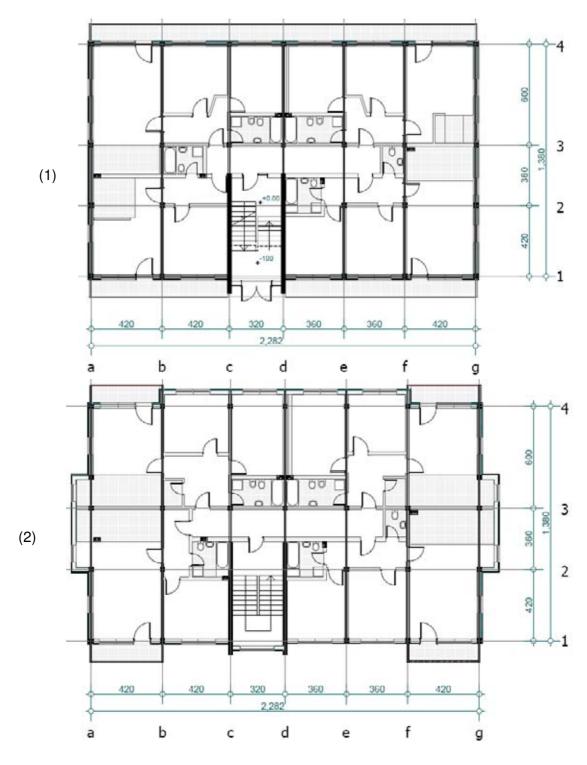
Ground floor (1) and characteristic floor (2) layout plan of Building 3
